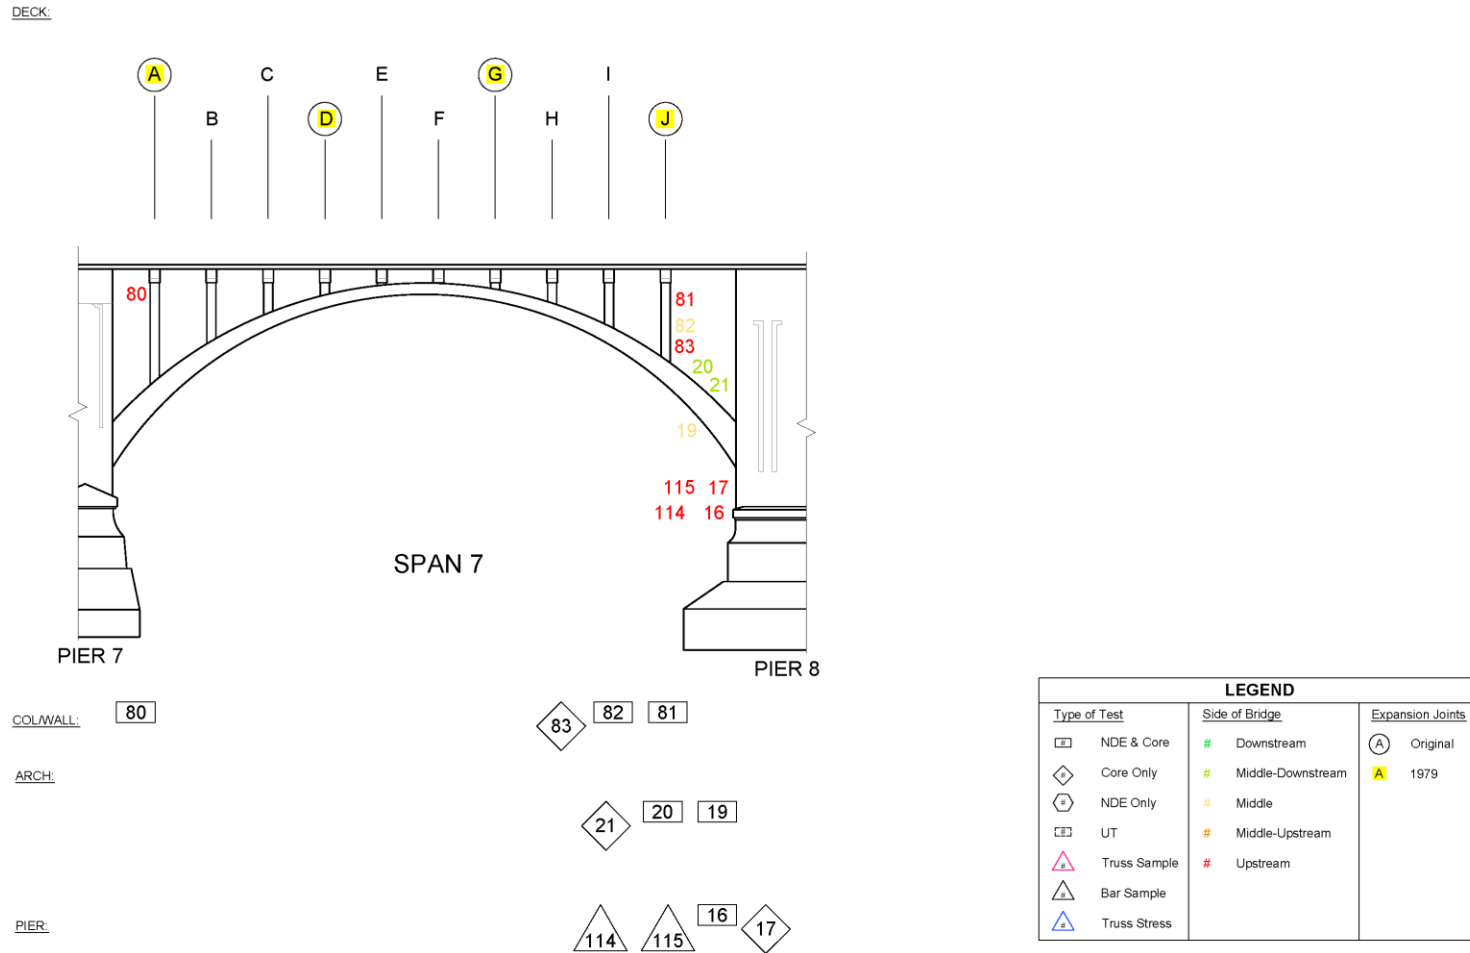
Follow-up Testing Location Summary - Arch Span 7.
